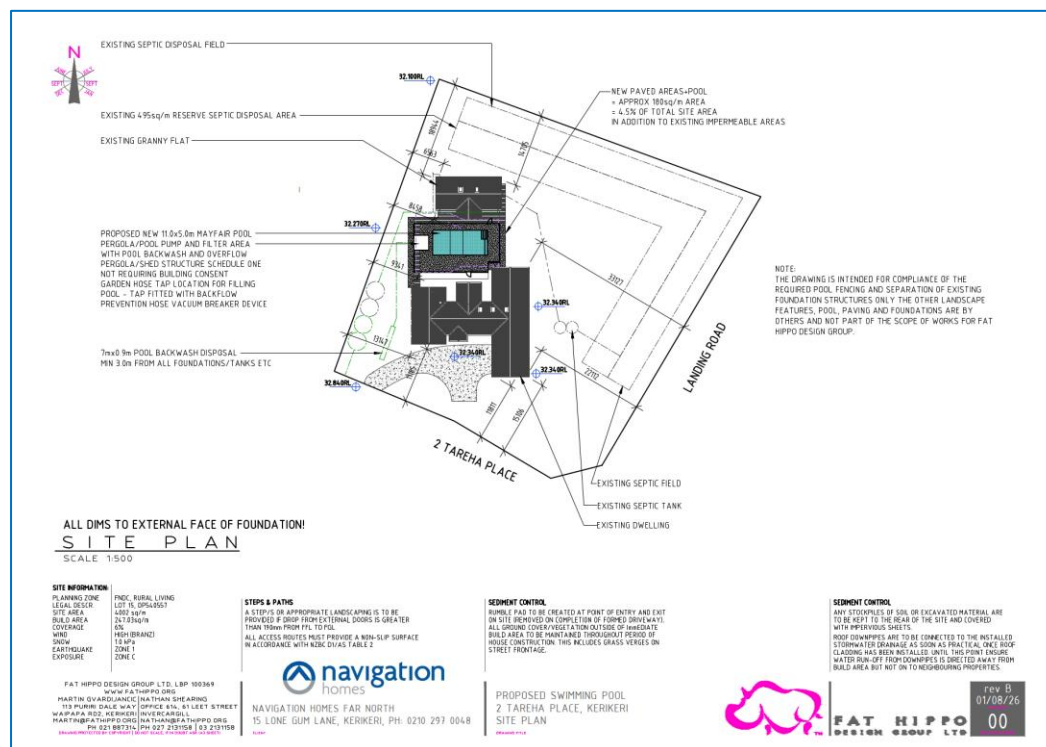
Site Plan (Source: Fat Hippo Design Group)
